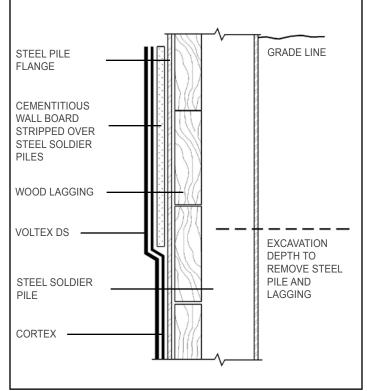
CEMENTITIOUS BOARD AT GRADE Install cementitious board strip over steel piling at grade to protect waterproofing during removal of top lagging timbers and top of steel pile (typically with acetylene torch). Remove cement board before backfilling.
